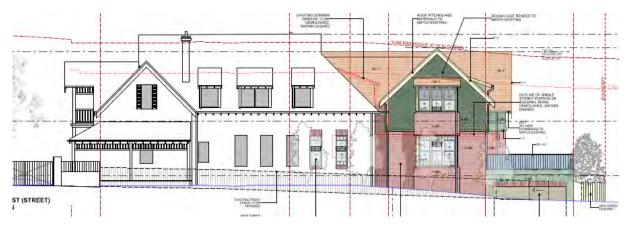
Secondary front elevation (Hopetoun Avenue).
